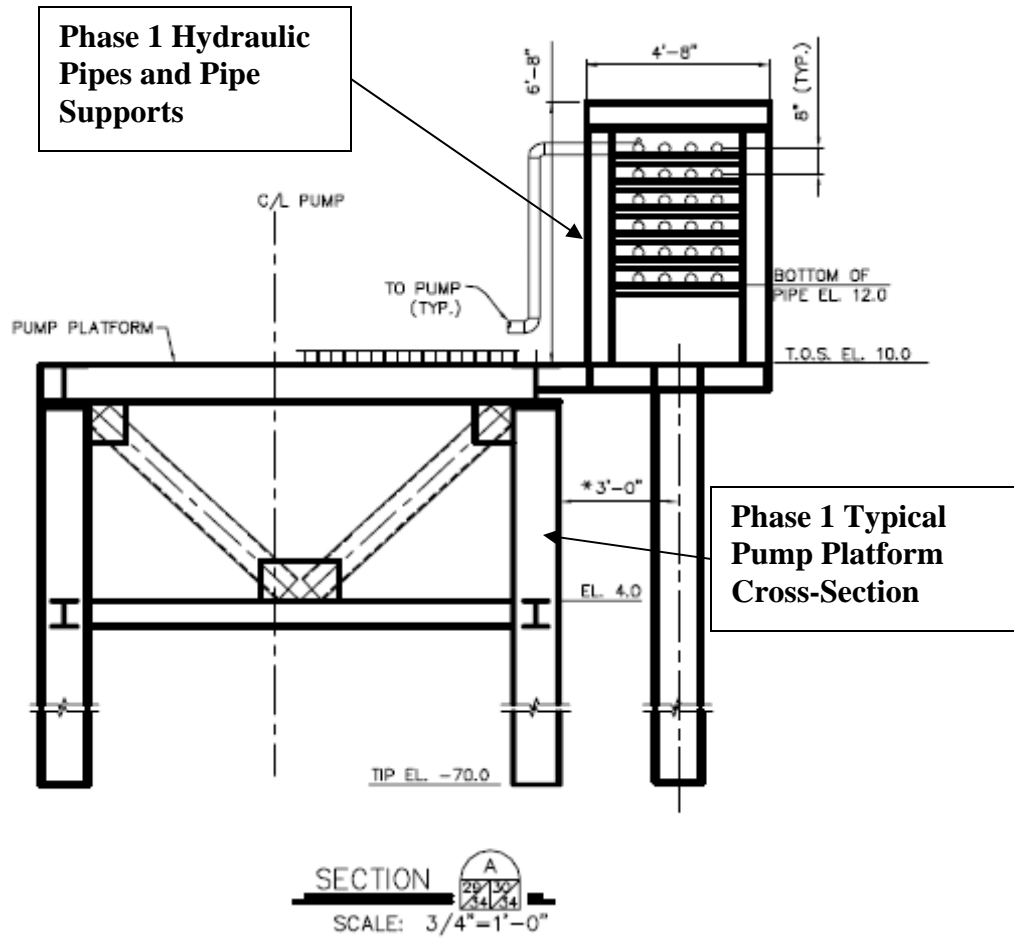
London Avenue Pump Platform and Hydraulic Fluid Piping Support
